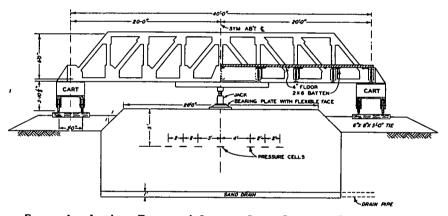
Loading Truss and Carts - Cross Section of Test Section
